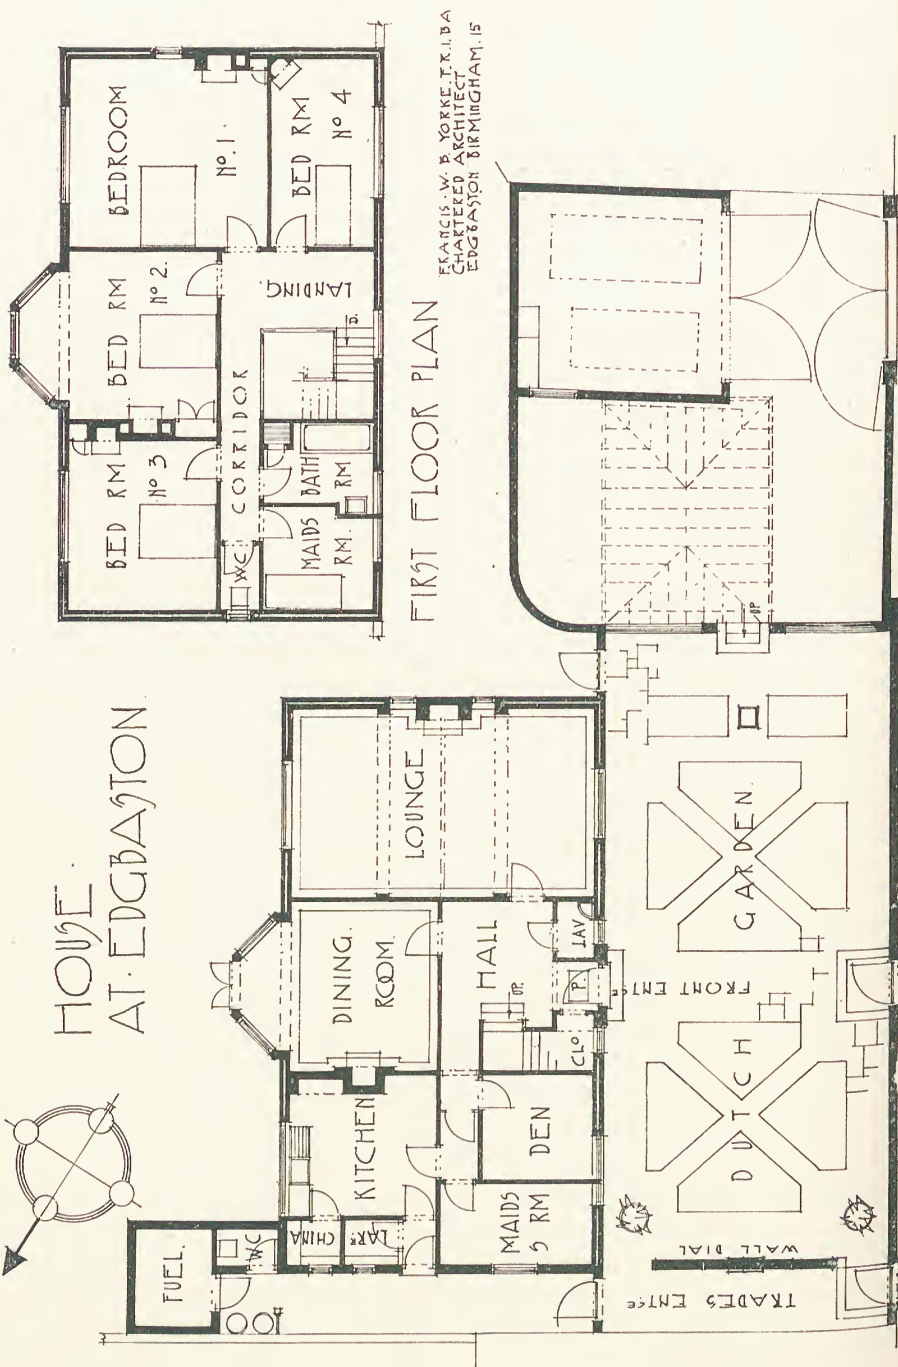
GROUND-FLOOR AND FIRST-FLOOR PLANS—HOUSE AT EDGBASTON
